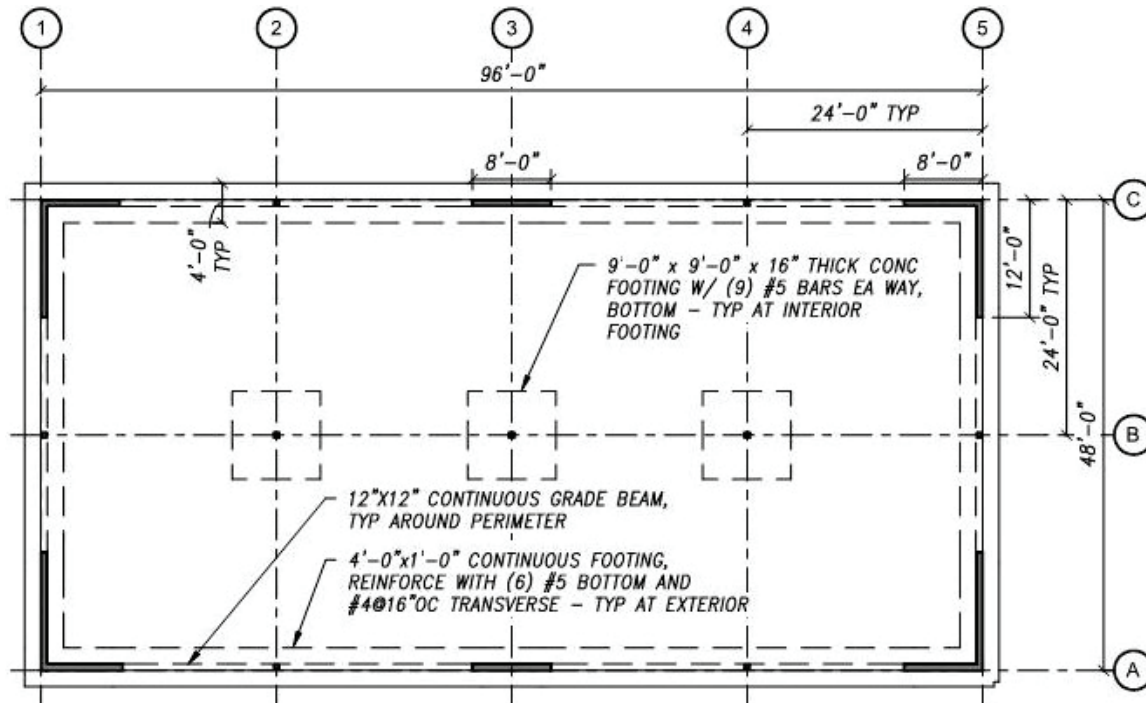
Two-story commercial building foundation plan: COM2 archetype on soft soil.
